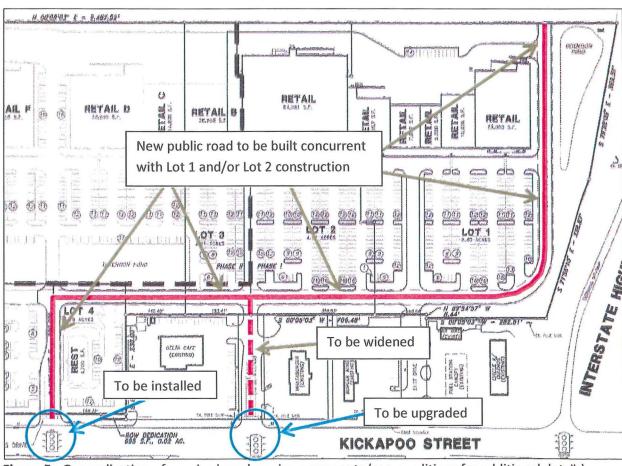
Generalization of required roadway improvements (see conditions for additional details).
